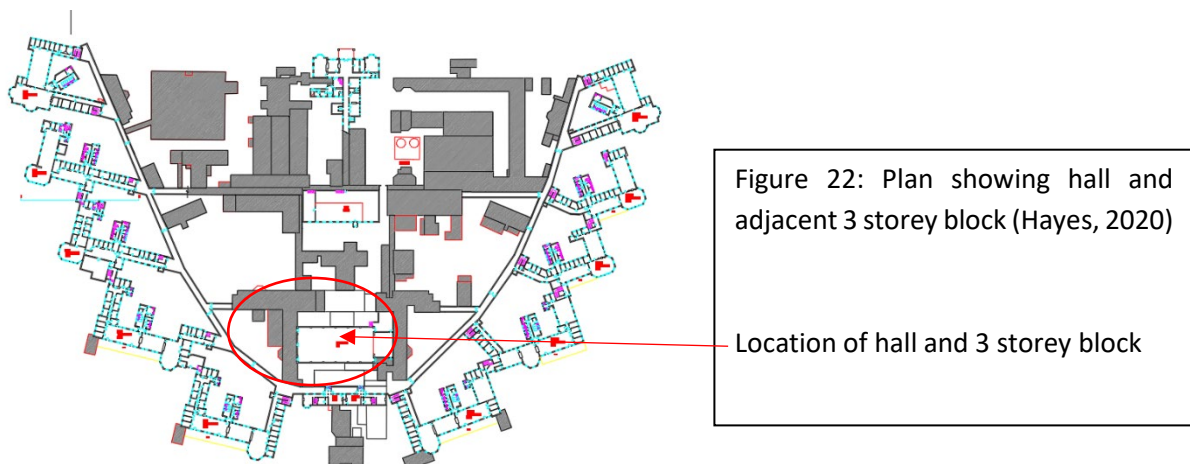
Plan showing hall and adjacent 3 storey block (Hayes, 2020)
